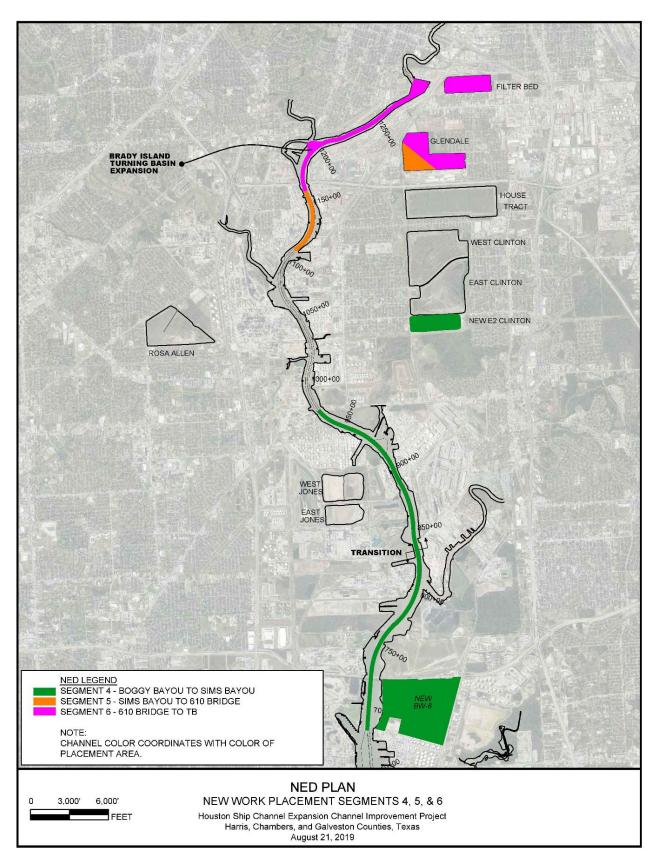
NED New Work Proposed Placement Segments 4, 5, & 6
